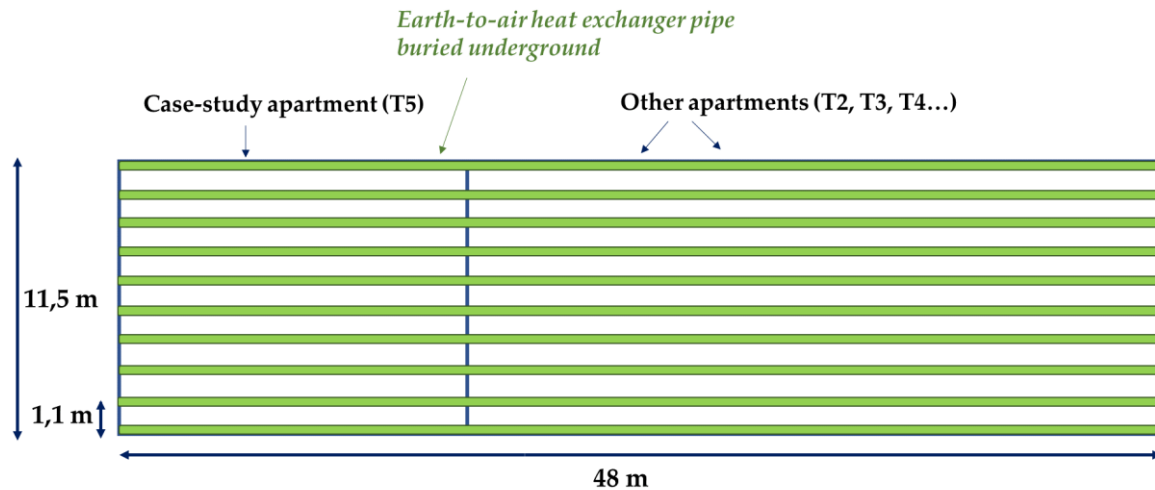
Representation of earth-to-air heat exchanger pipes disposition under the building
